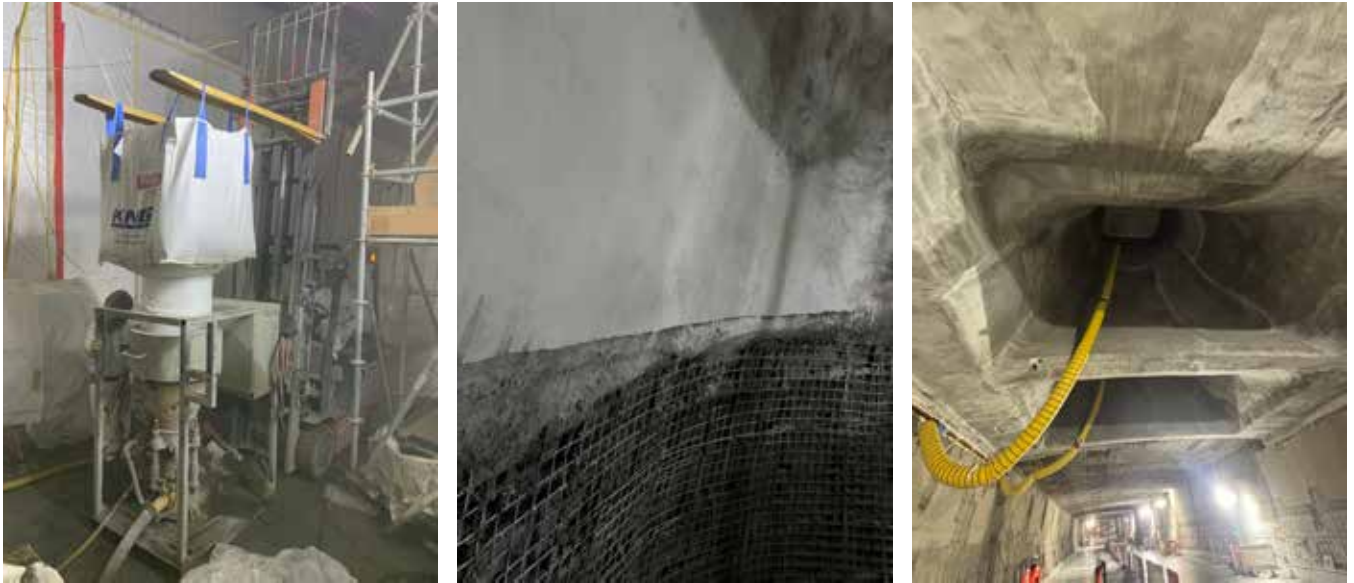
Result of the rehabilitation of one of the towers using fire-spalling resistant dry-mix shotcrete King® MS-D1 FSR. Photo credits: Sika Canada (2024) and Groupe LB (2026).
